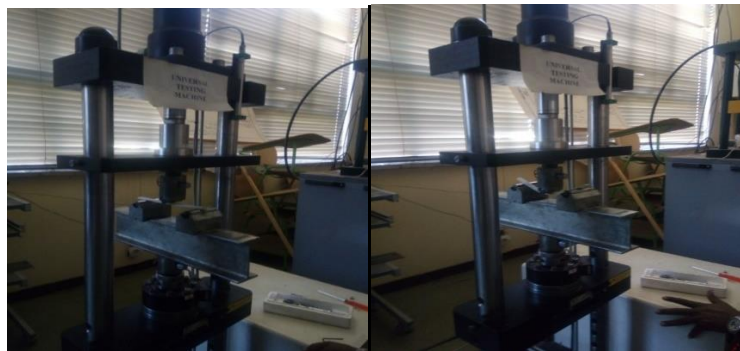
15 Flexural Test Setup Universal Testing Machine
